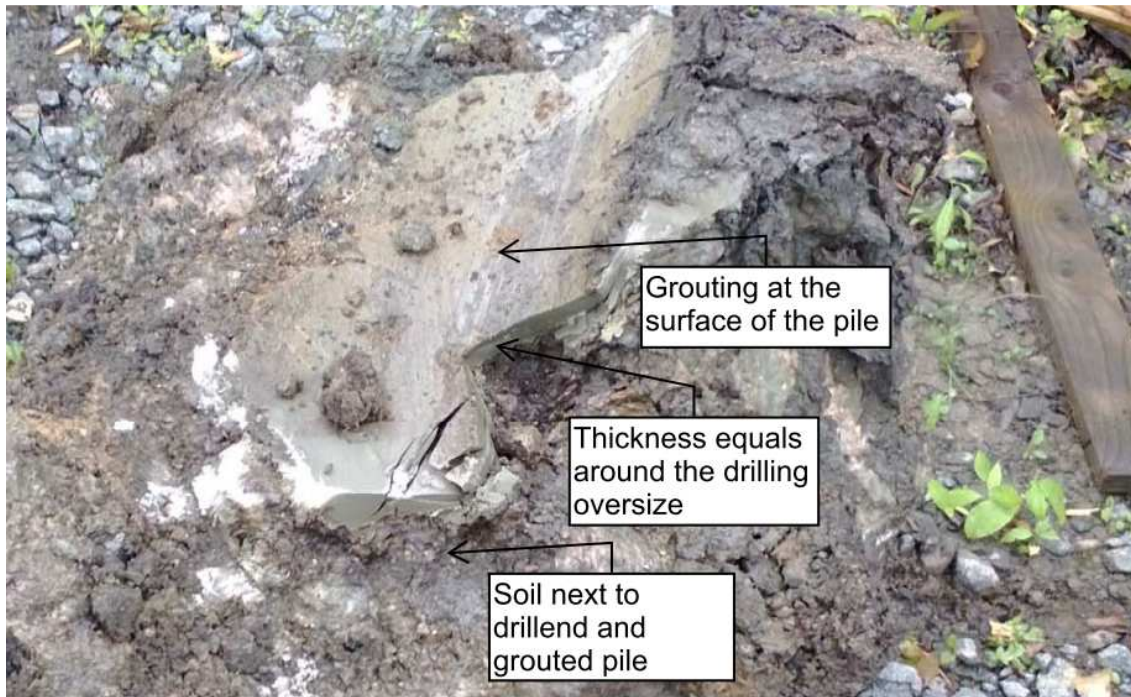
Soil pieces collected next to the pile with background grouting. The grouting was spread mostly into the excess drill space next to pile. This picture was taken at the Masku test site.
